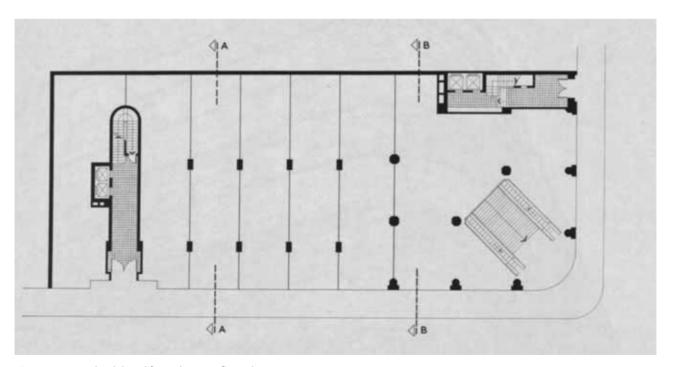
Santiago de Chile, Edificio Oberpaur, floor plan
